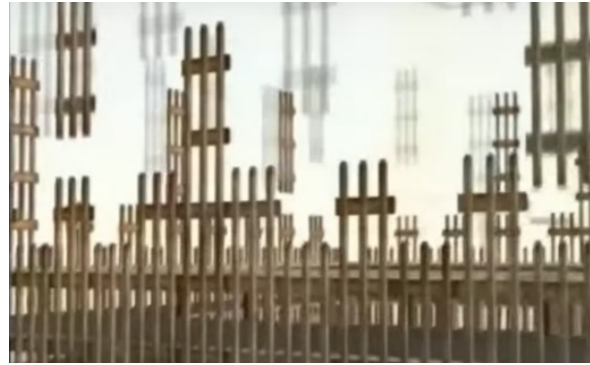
Illustration of column splice connection failure, due to out-of-plane bending, in the World Trade Center Towers [FEMA, 2002].
